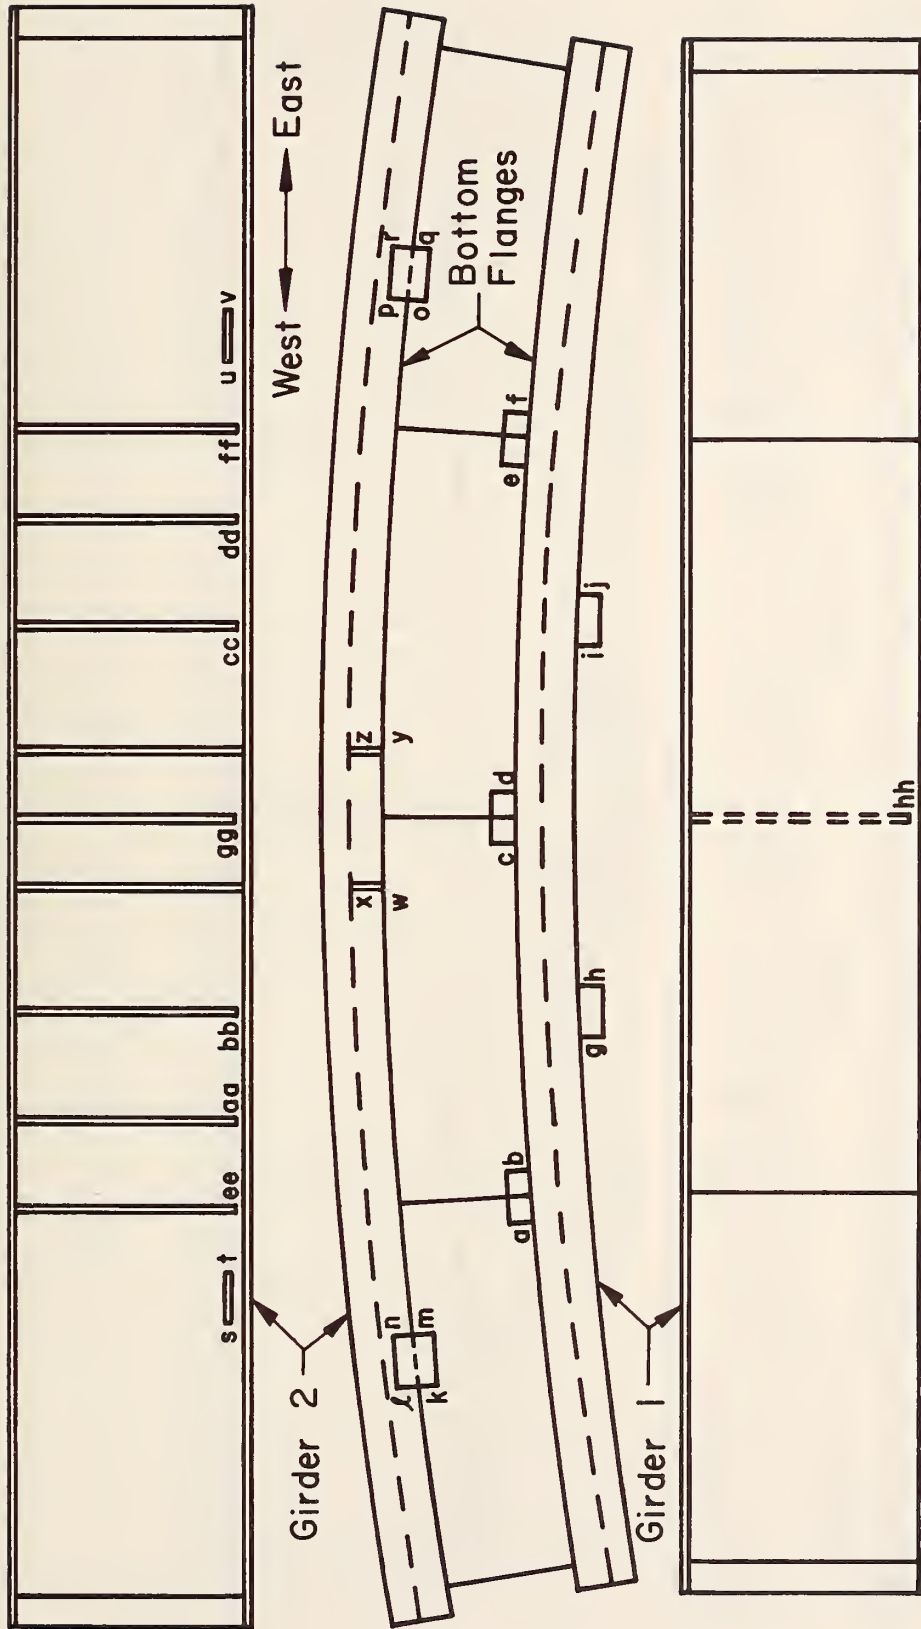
Group 1 and Group 2 Welded Details on Assembly 2
